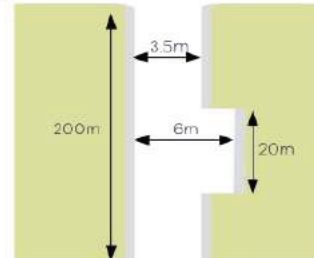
Access requirements (Technical Guide | Planning Permit Applications – Bushfire Management Overlay DELWP 2017).
